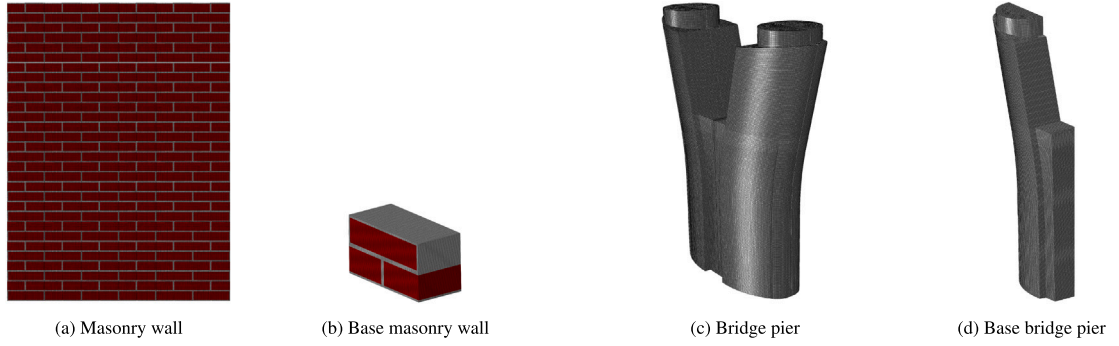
(Left) Test problem for substructuring: masonry wall model. (Right) Test problem for reflection symmetries: bridge pier model.
